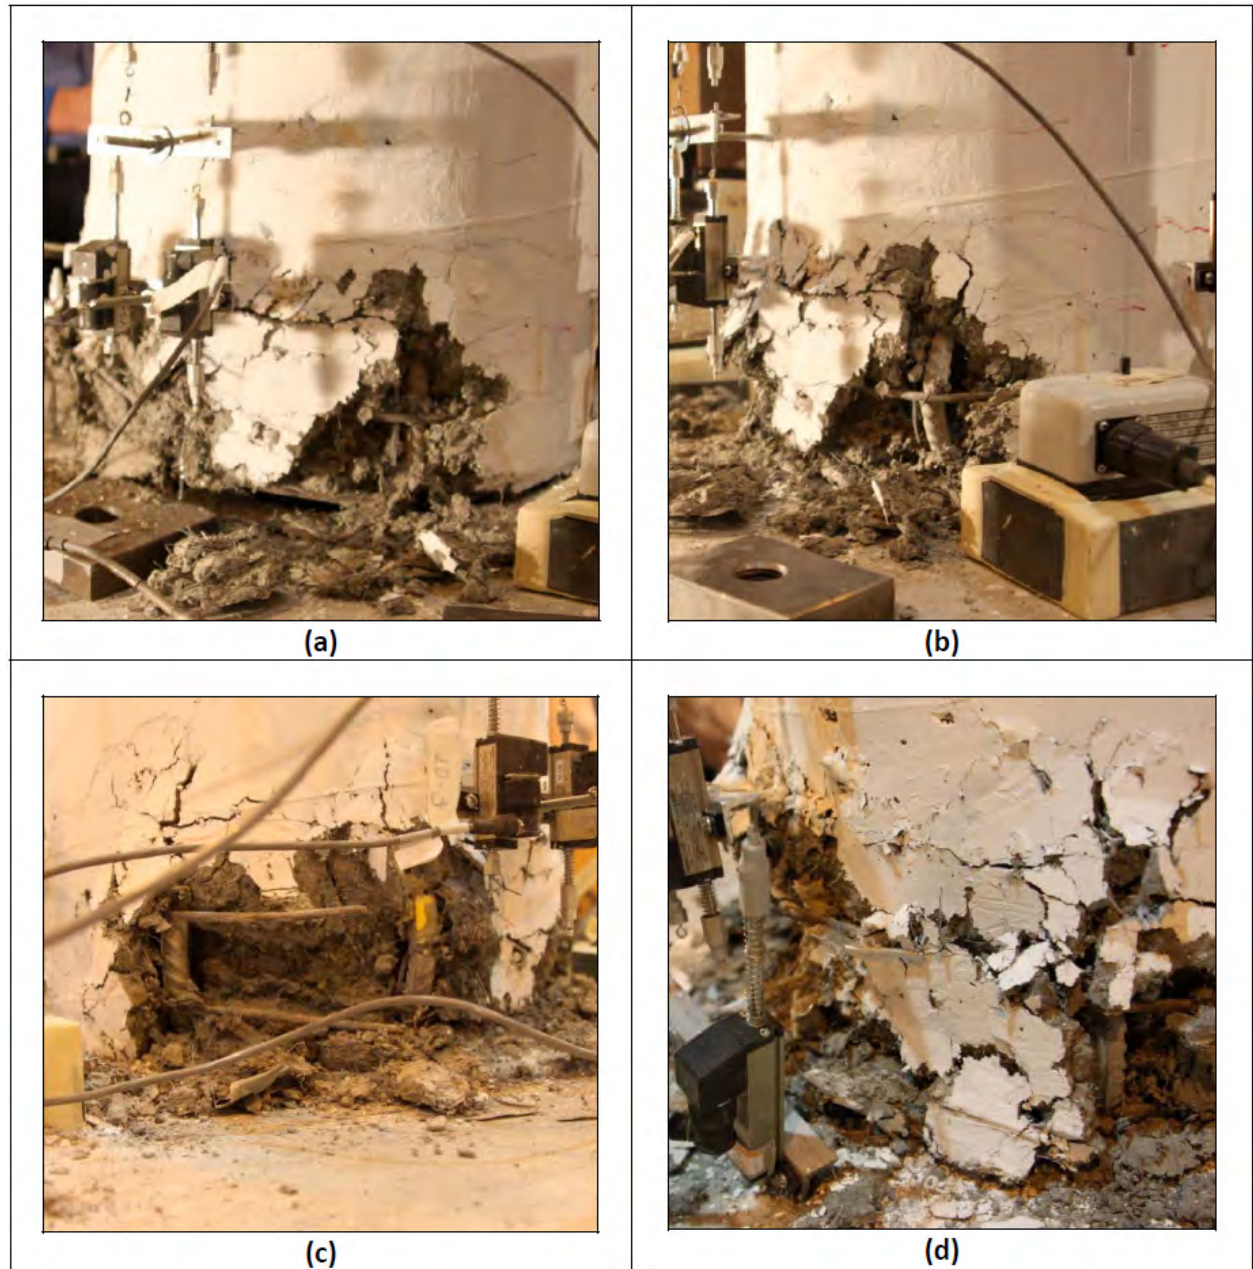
(a) Crushed concrete at the base of the east column face at $\theta_r = 8.3\%$; (b) buckling of longitudinal bar C206 at $\theta_r = 8.3\%$; (c) fracture of longitudinal bar C205 at $\theta_r = 9.5\%$; and (d) damage at the base of the west face of the column at $\theta_r = 11.3\%$.
